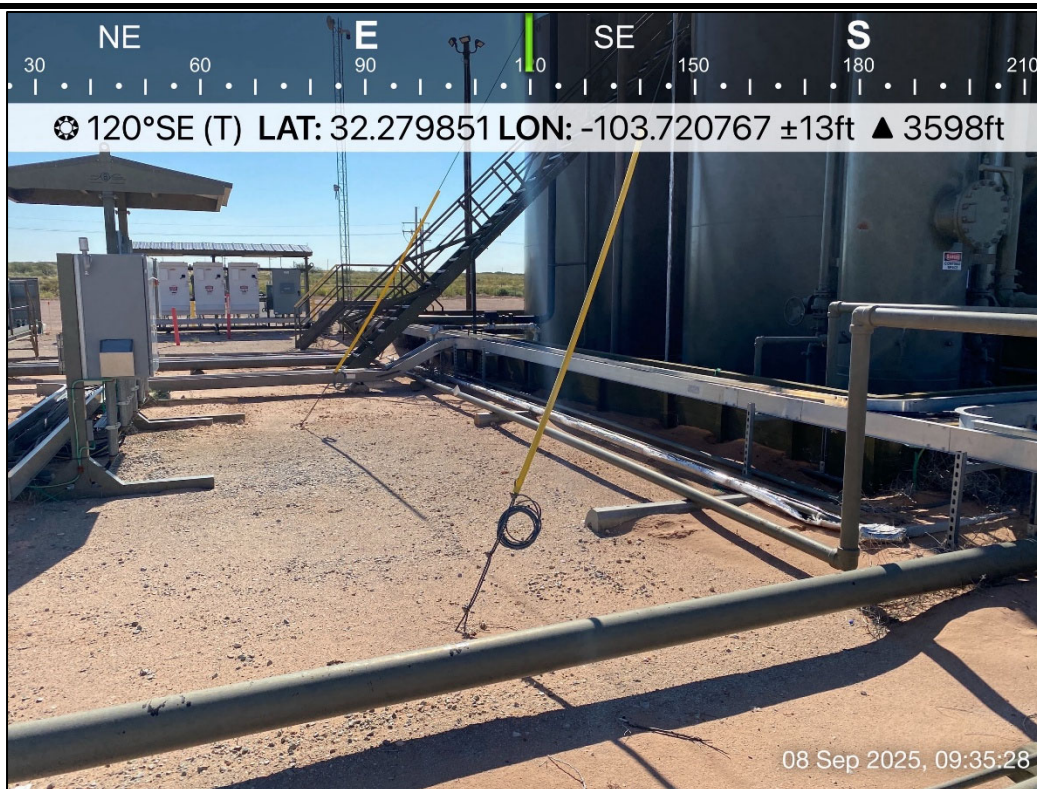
Southeastern view outside of containment during liner inspection activities. 9/8/2025
